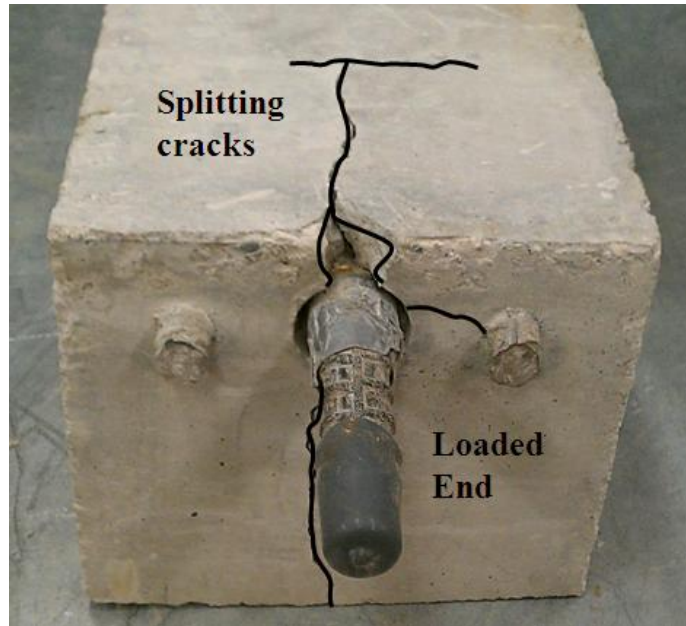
Main anchorage zone and splitting crack pattern (dissected BE-RAC3-40-125B)
